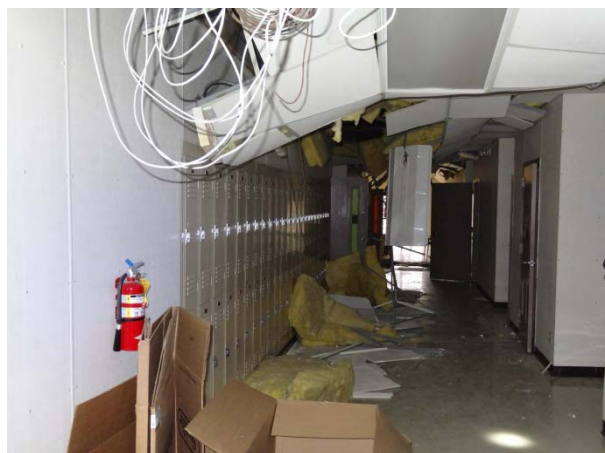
Classroom Annex Interior Hallway and Ceiling Damage at WMS
